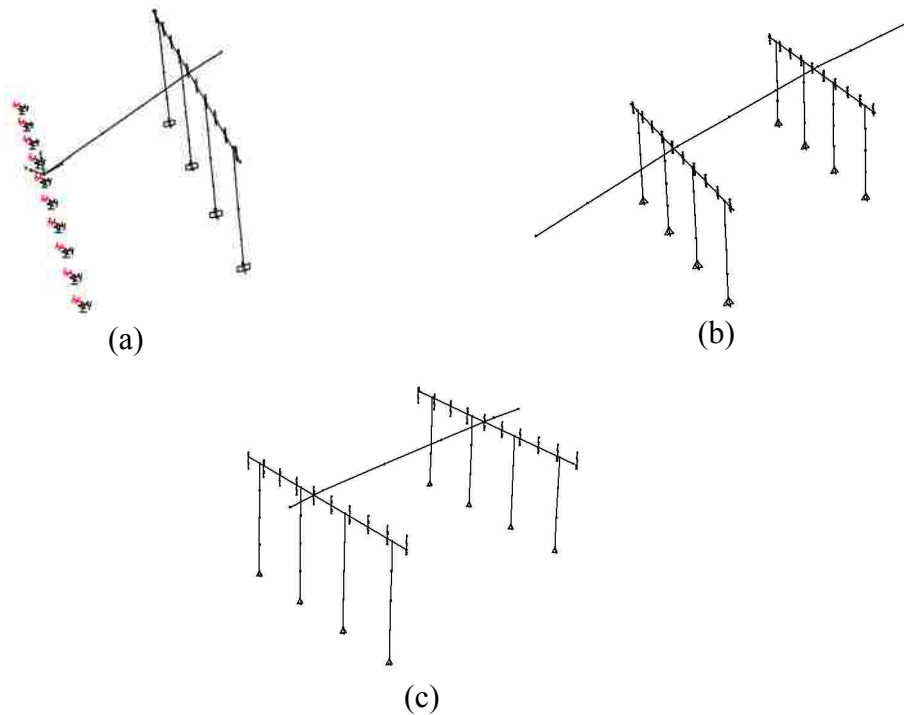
Bridge G-953 - Structural models for longitudinal direction
